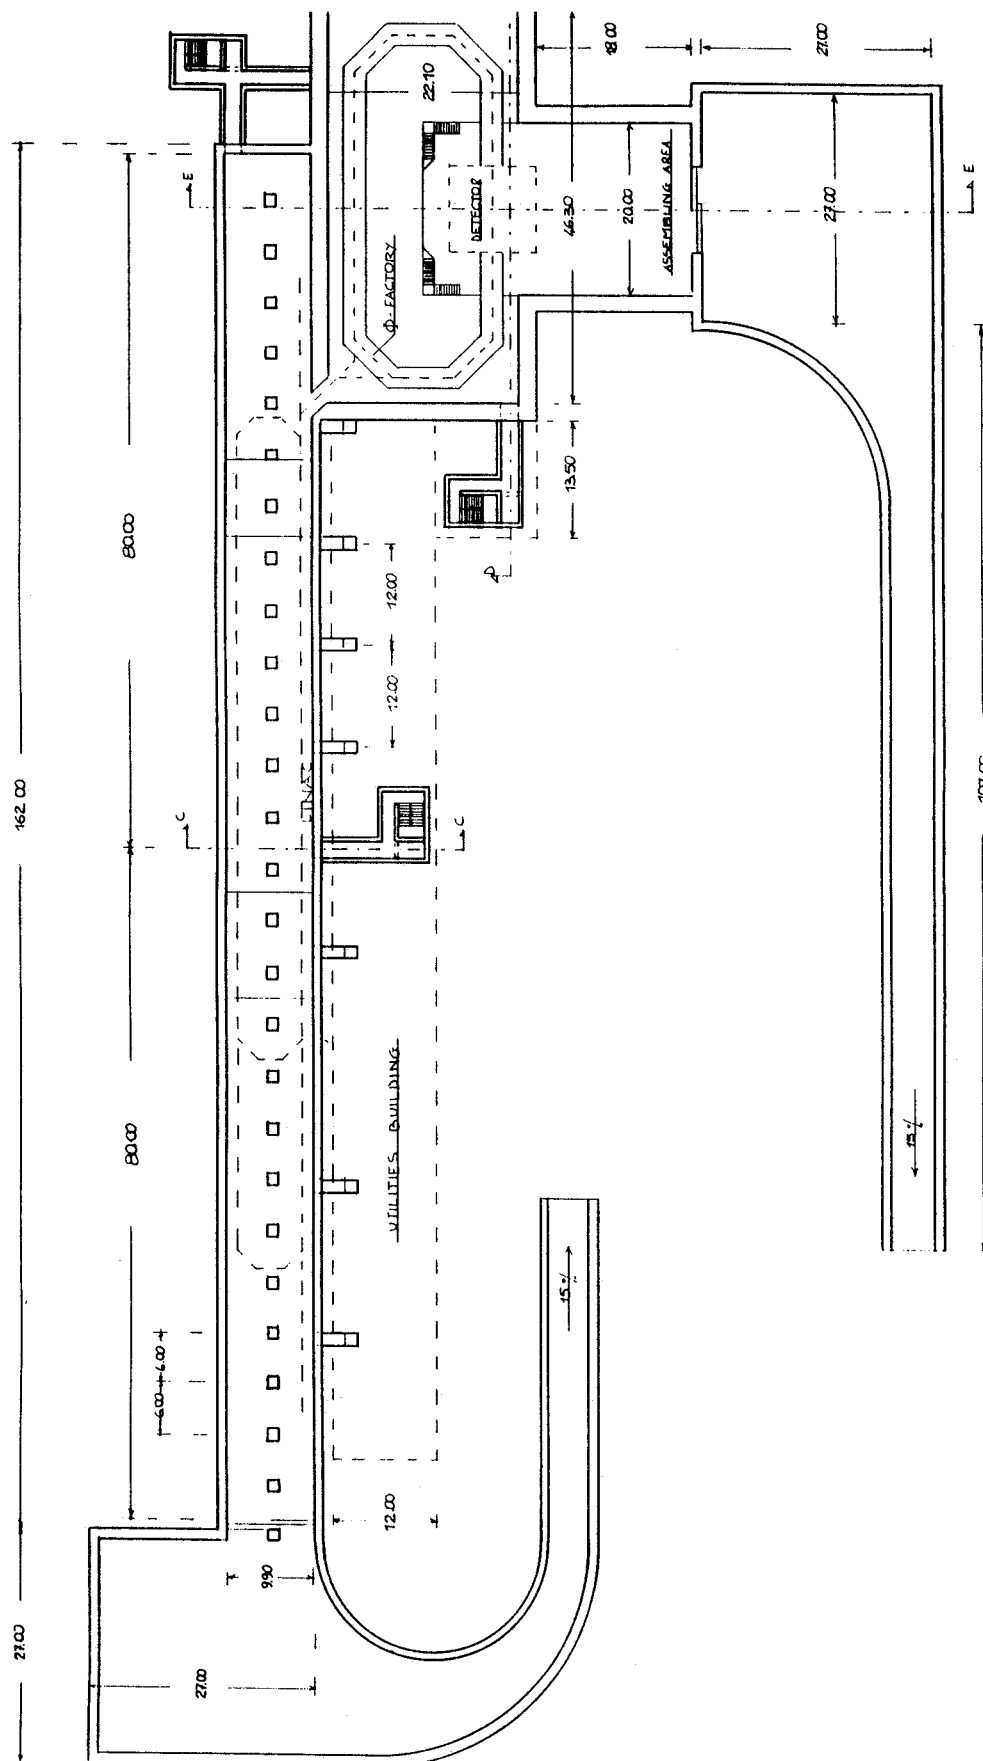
Planimetry including the Linac tunnel and experimental hall, the  $\Phi$ -Factory hall with the detector assembly space, the power and plant buildings, urbanization and roadwork.
